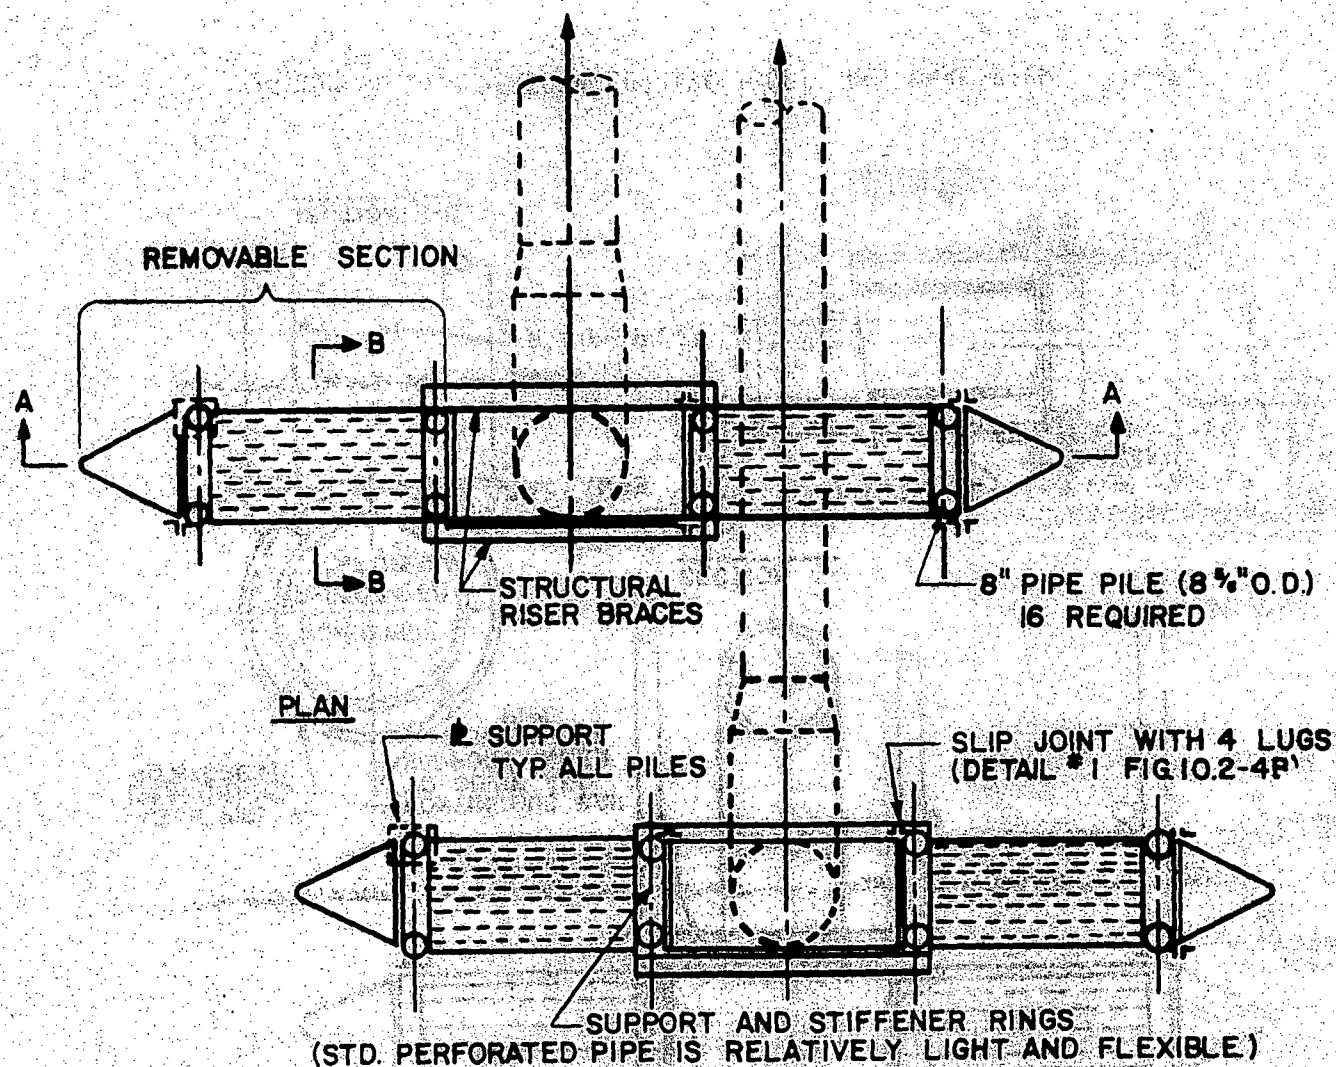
PERFORATED PIPE INLET PLAN VIEW
